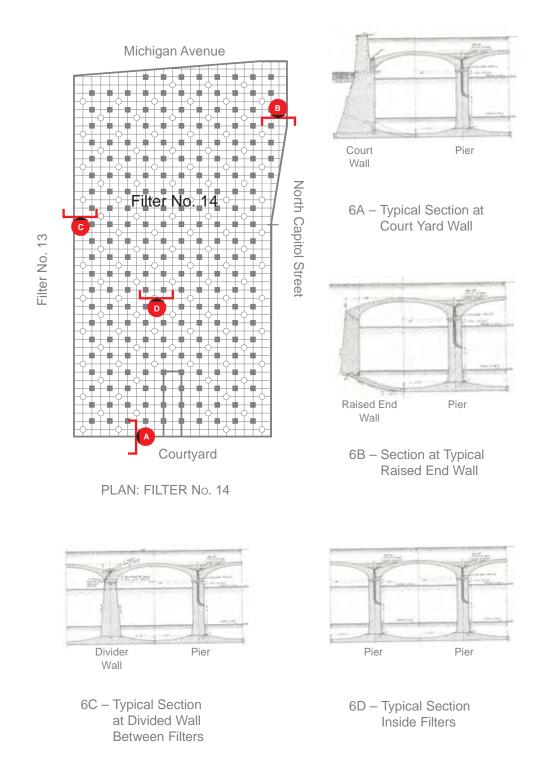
CROSS SECTIONS OF SLOW SAND FILTER No. 14 WITH TYPICAL SECTIONS
